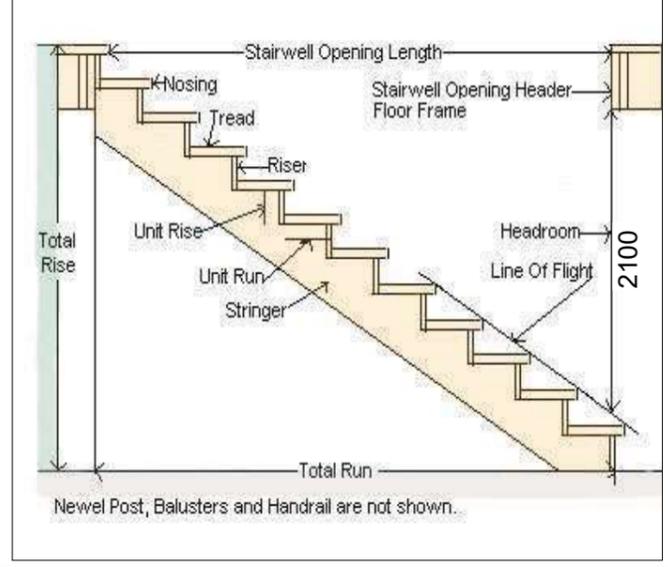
STAIR RISER AND GOING DIMENSIONS (mm)
